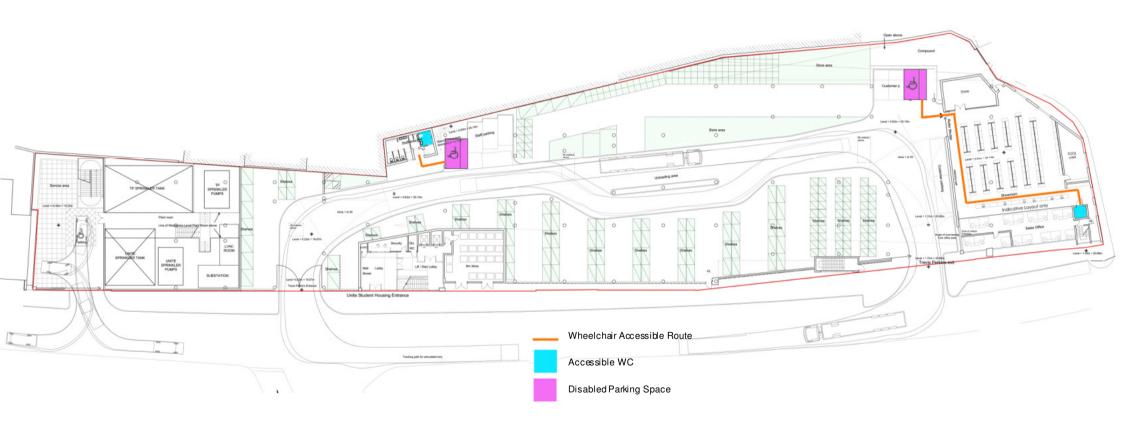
1 - Access Diagram - Travis Perkins Facility
